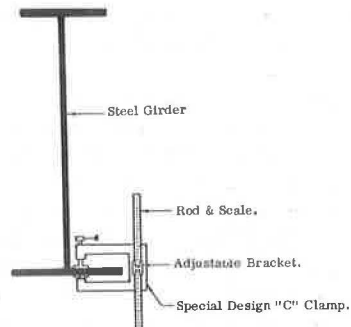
Typical rod and scale unit attached to the lower flange of a bridge girder.
